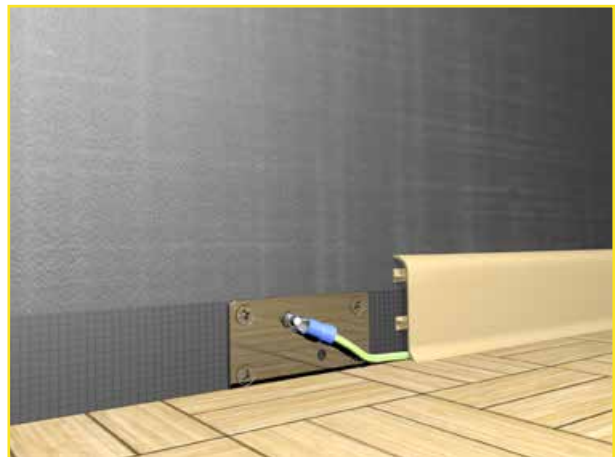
Attaching the grounding plate EGP and connecting the grounding wire
